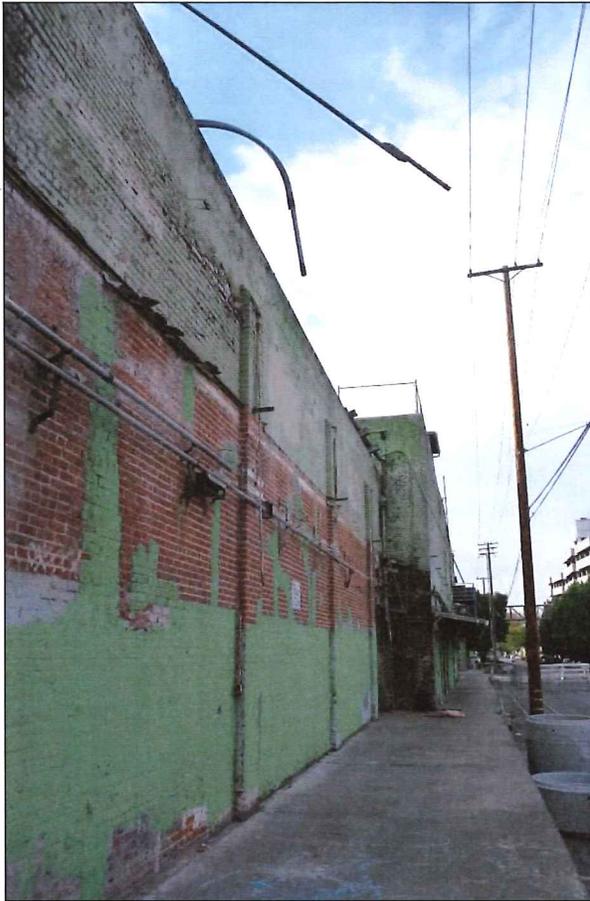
LOADING DOCK ALONG SOUTH SIDE OF BUILDING 2, CAMERA FACING WEST
